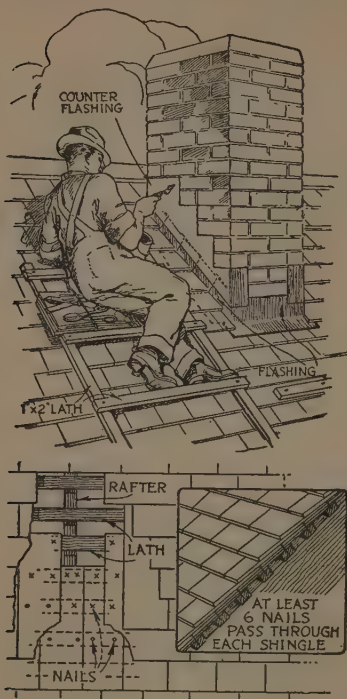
Upper view—cementing counter flashing in place. Lower view—how shingles are laid and where the nails usually are placed.
